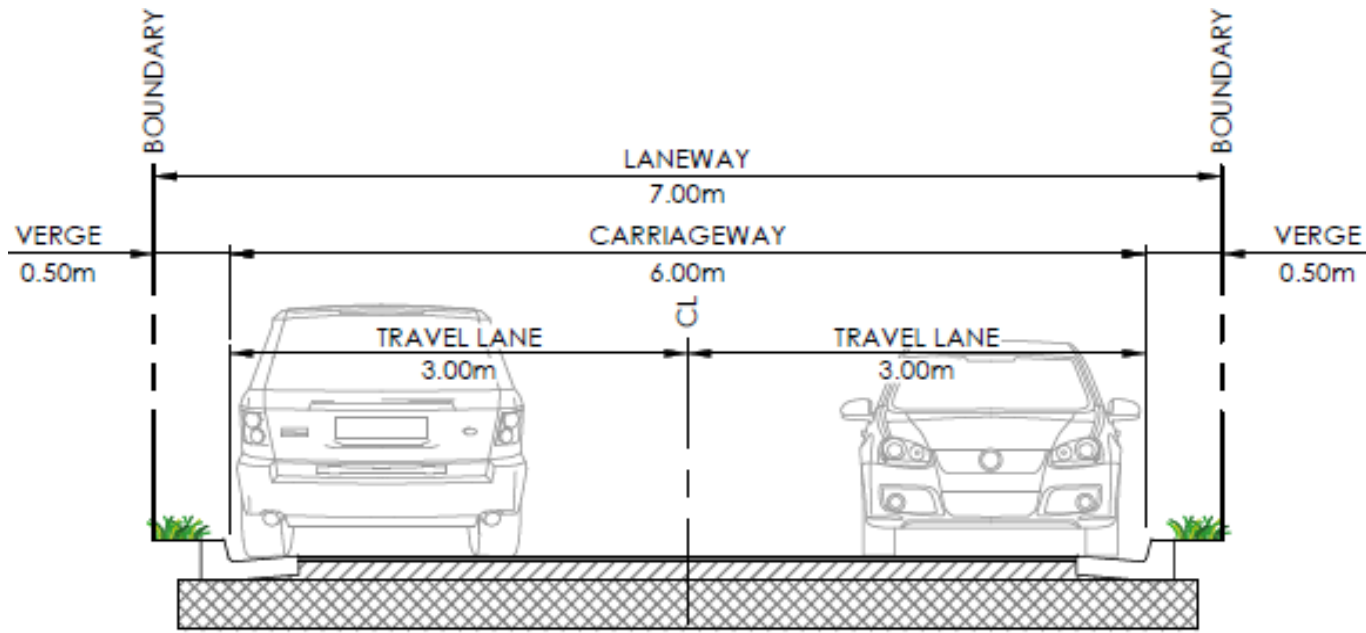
Minor Local Road (Adjacent to Local Park/ District Park 3)
